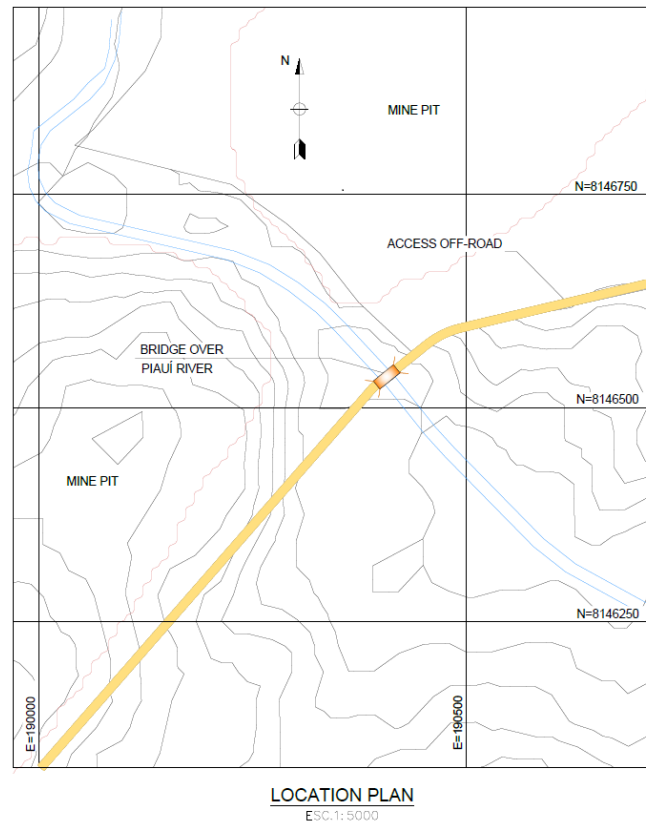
Proposed Bridge Location Xuxa Mine
